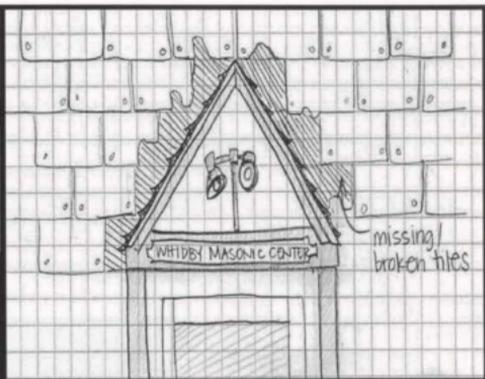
Sketch showing the shingle condition over the gabled projection. Note how large the area of missing and broken tiles is.
